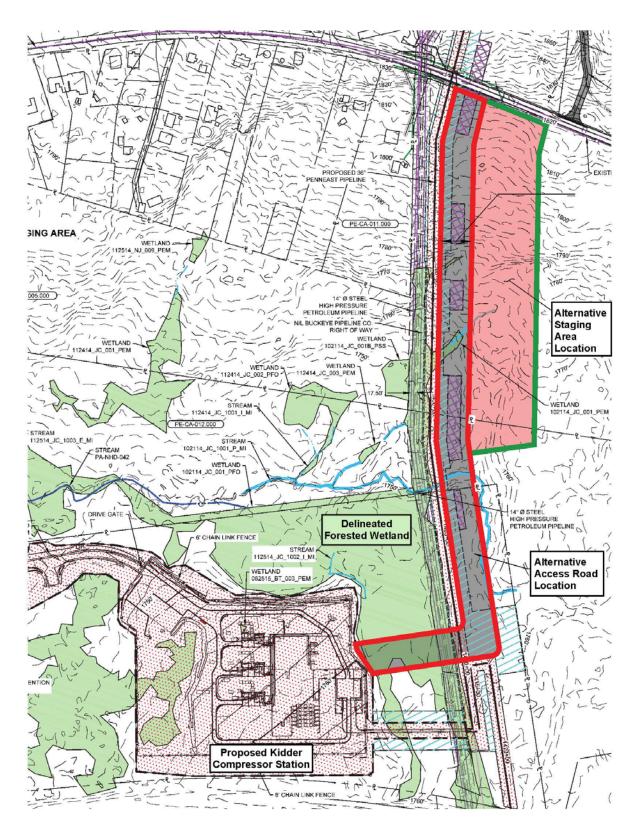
Kidder Compressor Station Access Road Alternative
